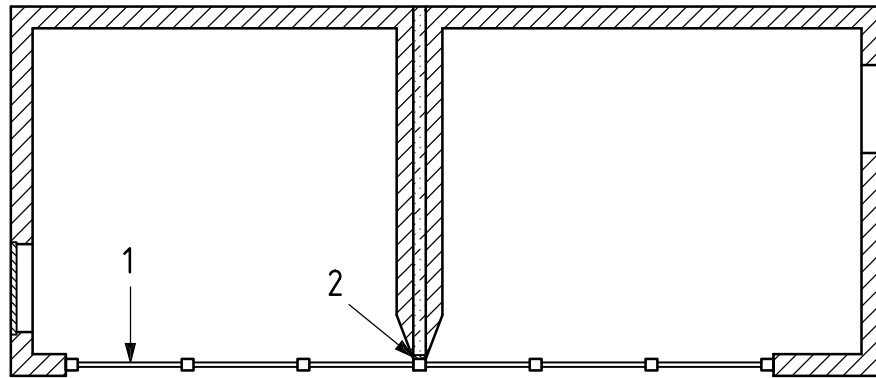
Requirement for the dimensions of the laboratory and for the mounting of the suspended ceiling and the dividing wall
